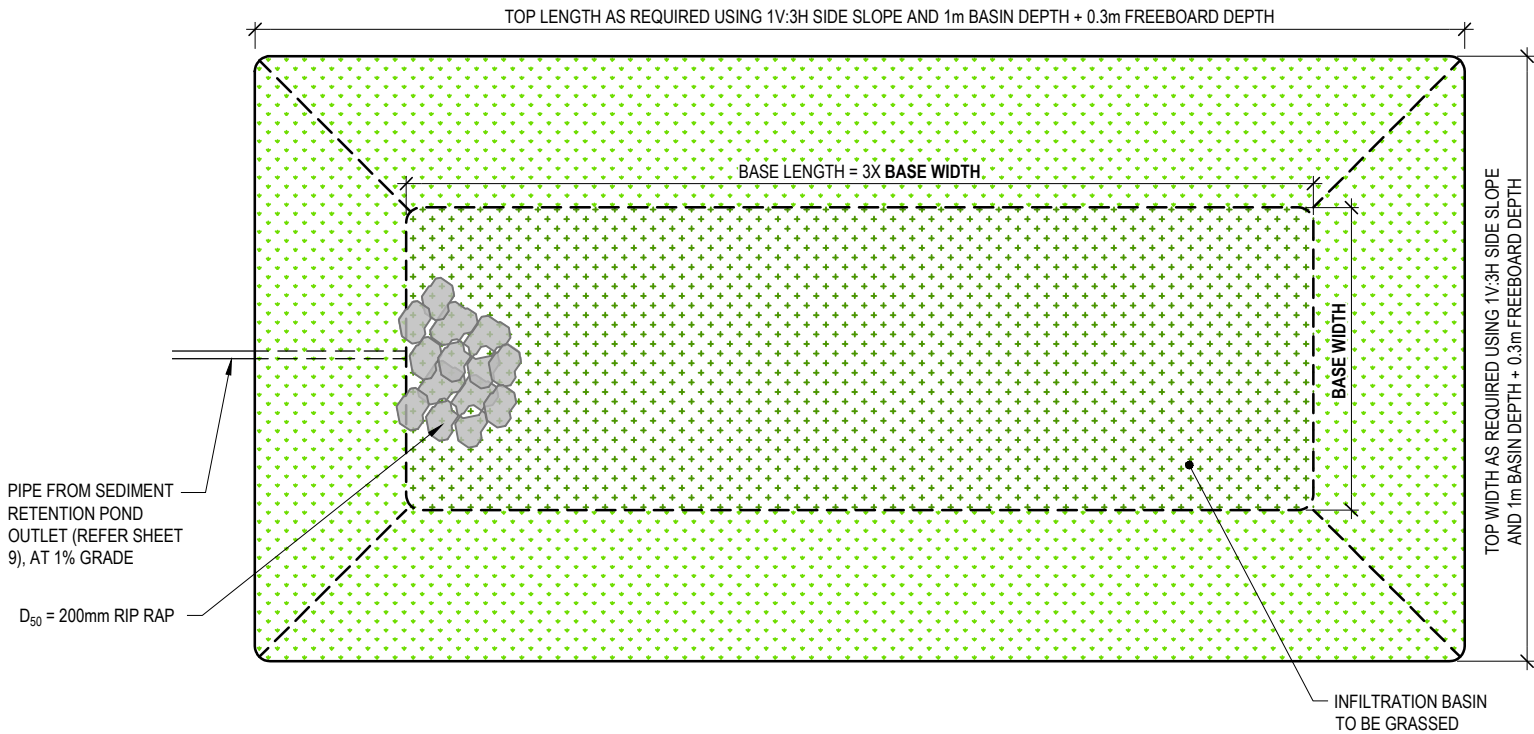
INFILTRATION BASIN PLAN VIEW
